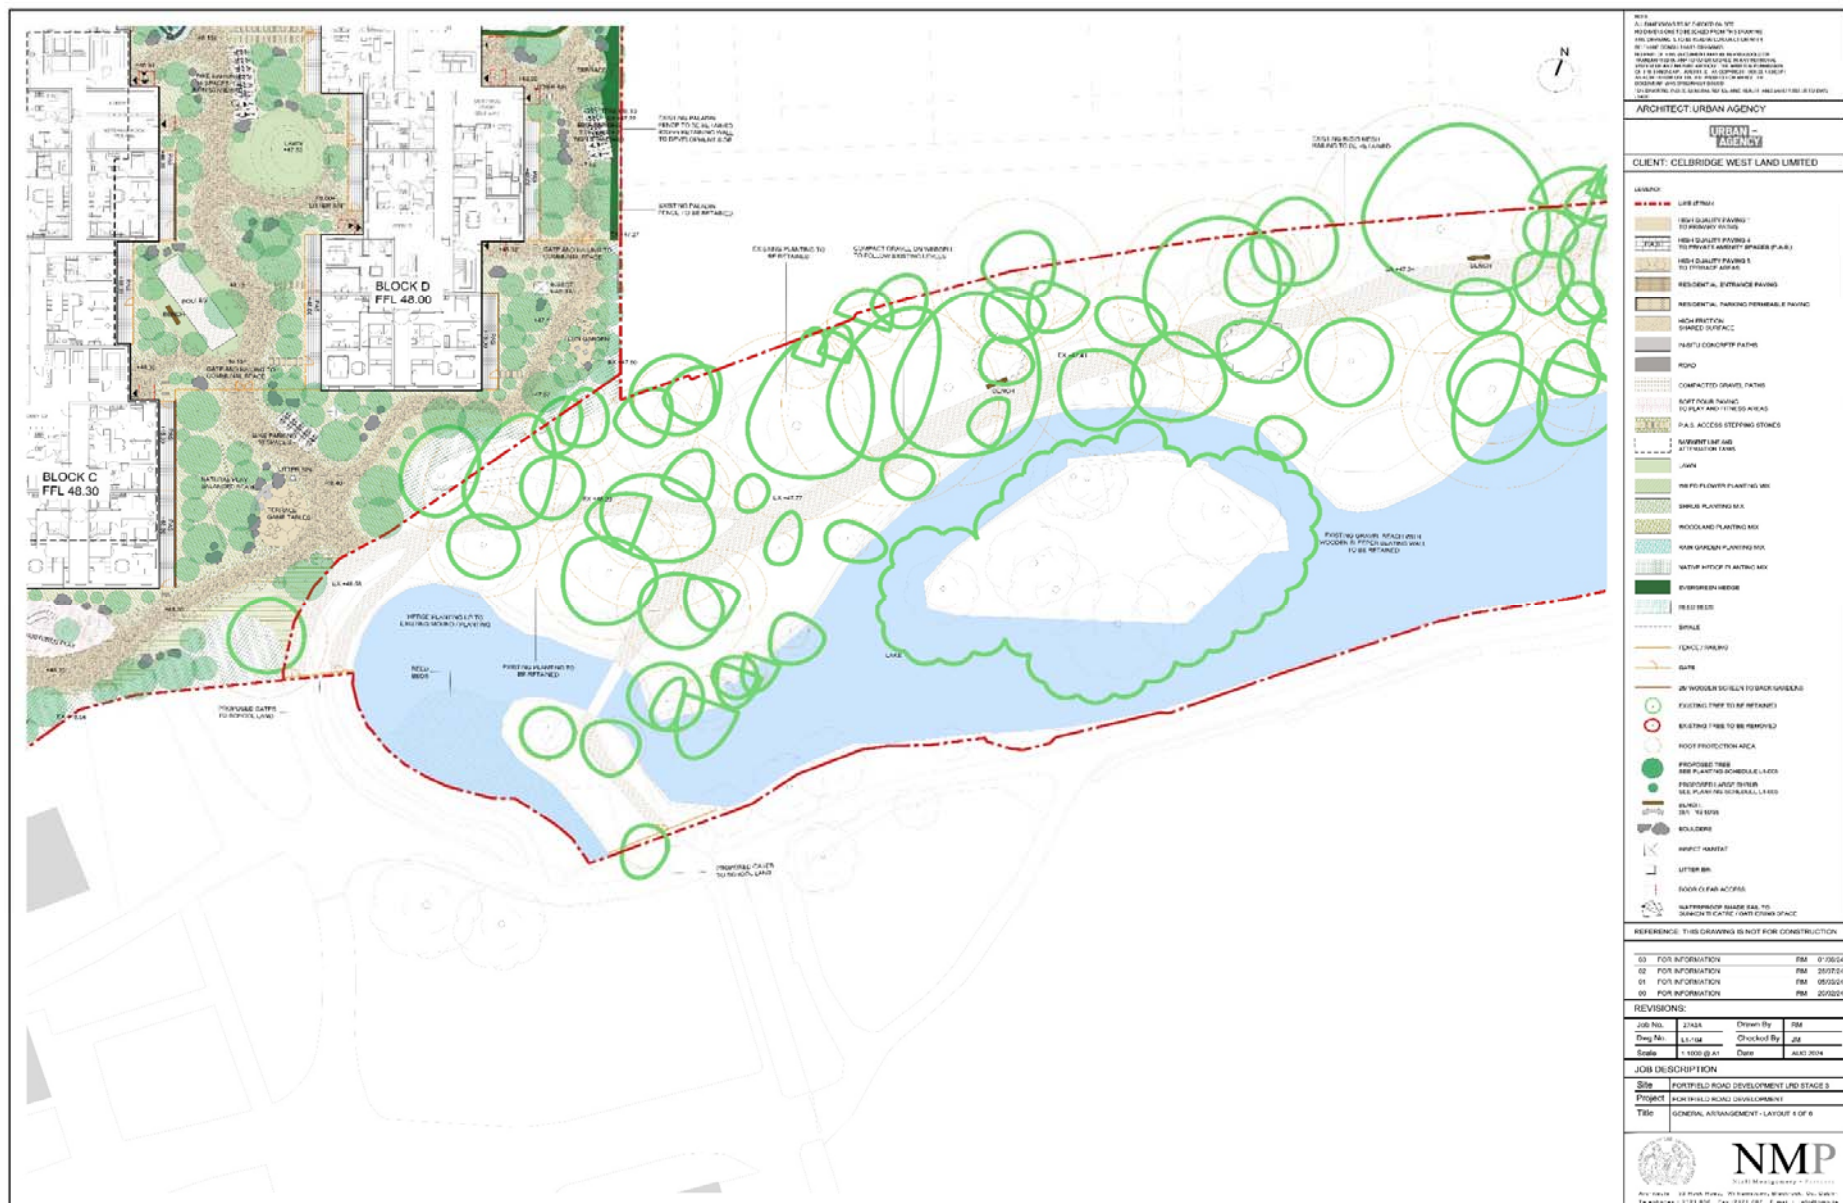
Landscape General Arrangements Plan (Sheet 6 of 6)
